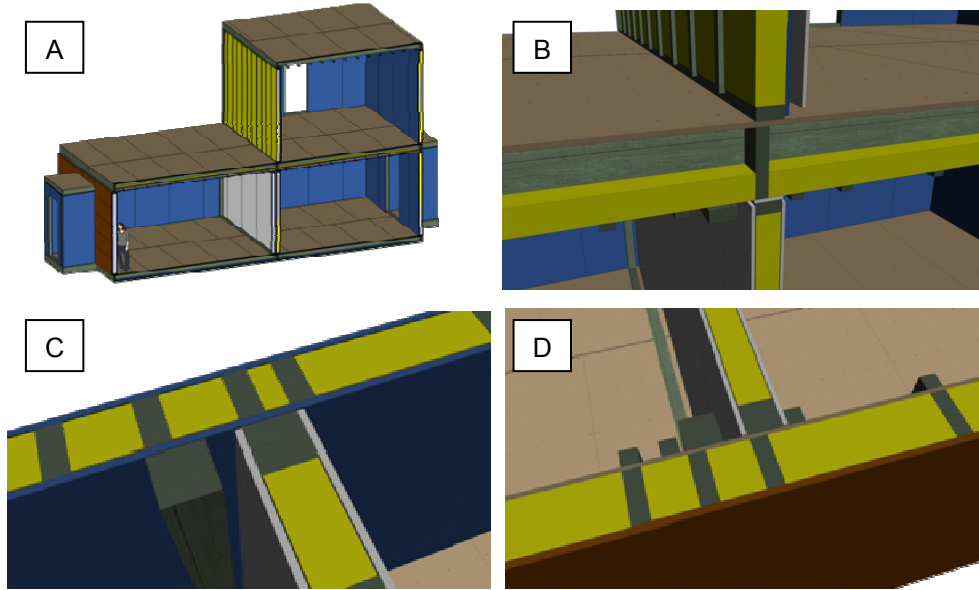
A: Vertical cut - B: connection between floor and partition wall. - C: connection between partition wall and ‘interior’ walls. - D: connection between partition wall and ‘exterior’ walls.
